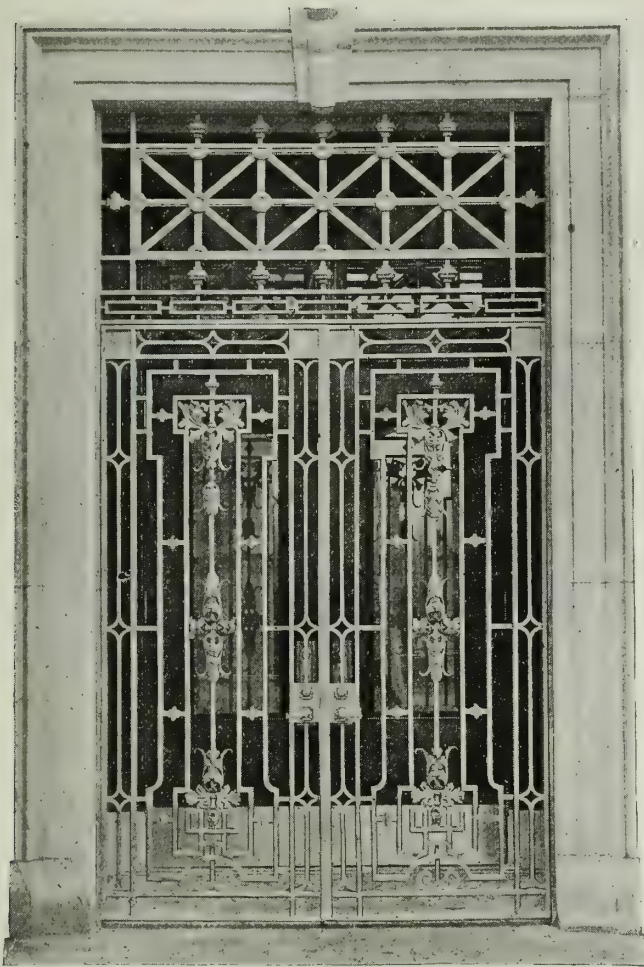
DOORS FOR DETROIT SAVINGS BANK
